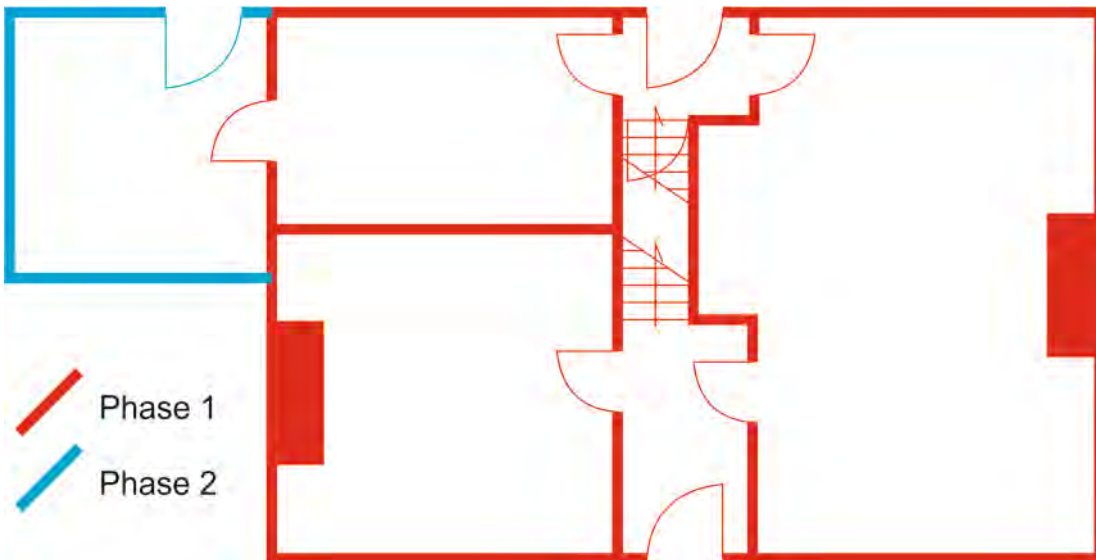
Farm House Ground floor phase plan, 1:100 @ A4
